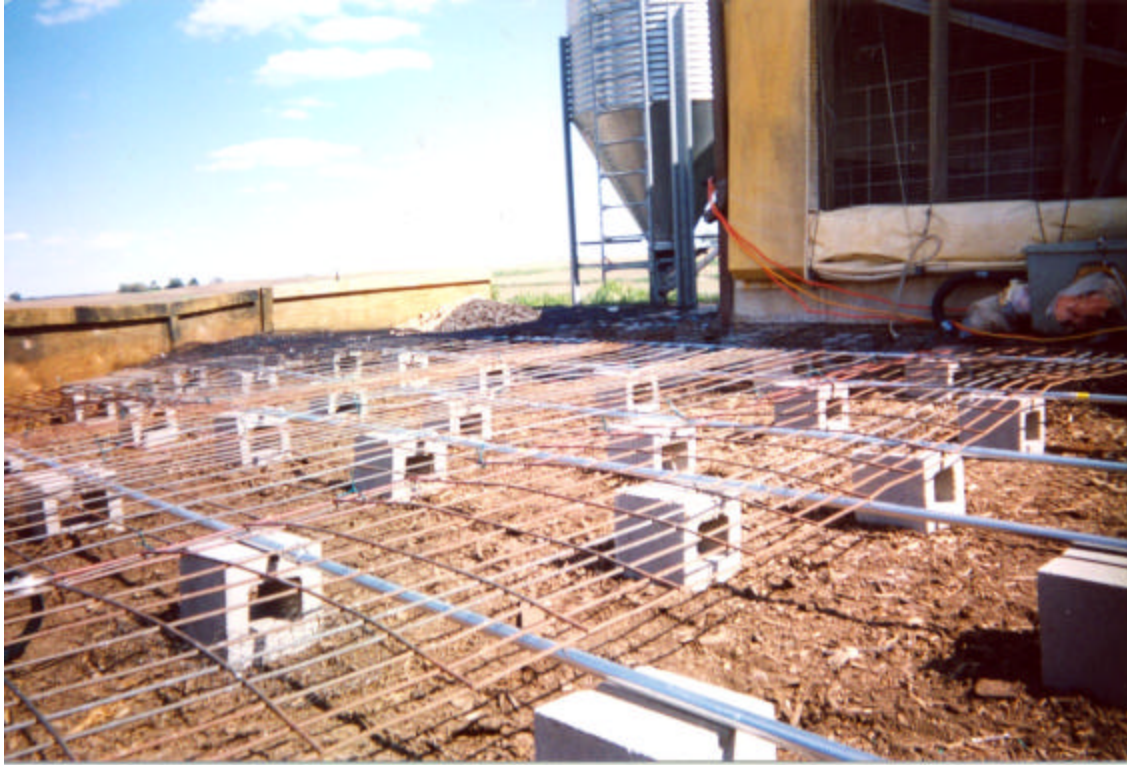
Revised biofilter plenum layout with 8" blocks, electrical conduit, and hog panel.
